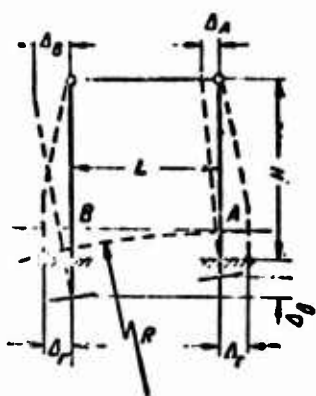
Scheme for calculating the deformations of the structural frame of a building.
